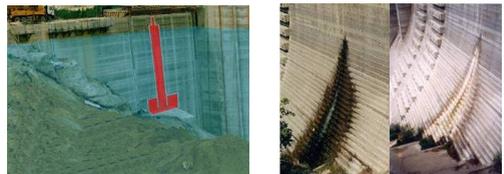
At left artist's impression of the repair of the crack executed underwater at Platanovyssi RCC Dam, Greece 2002. At right, the downstream appearance of the crack before and a few hours after installation of the external waterstop: the leakage stopped and the crack dried out.
